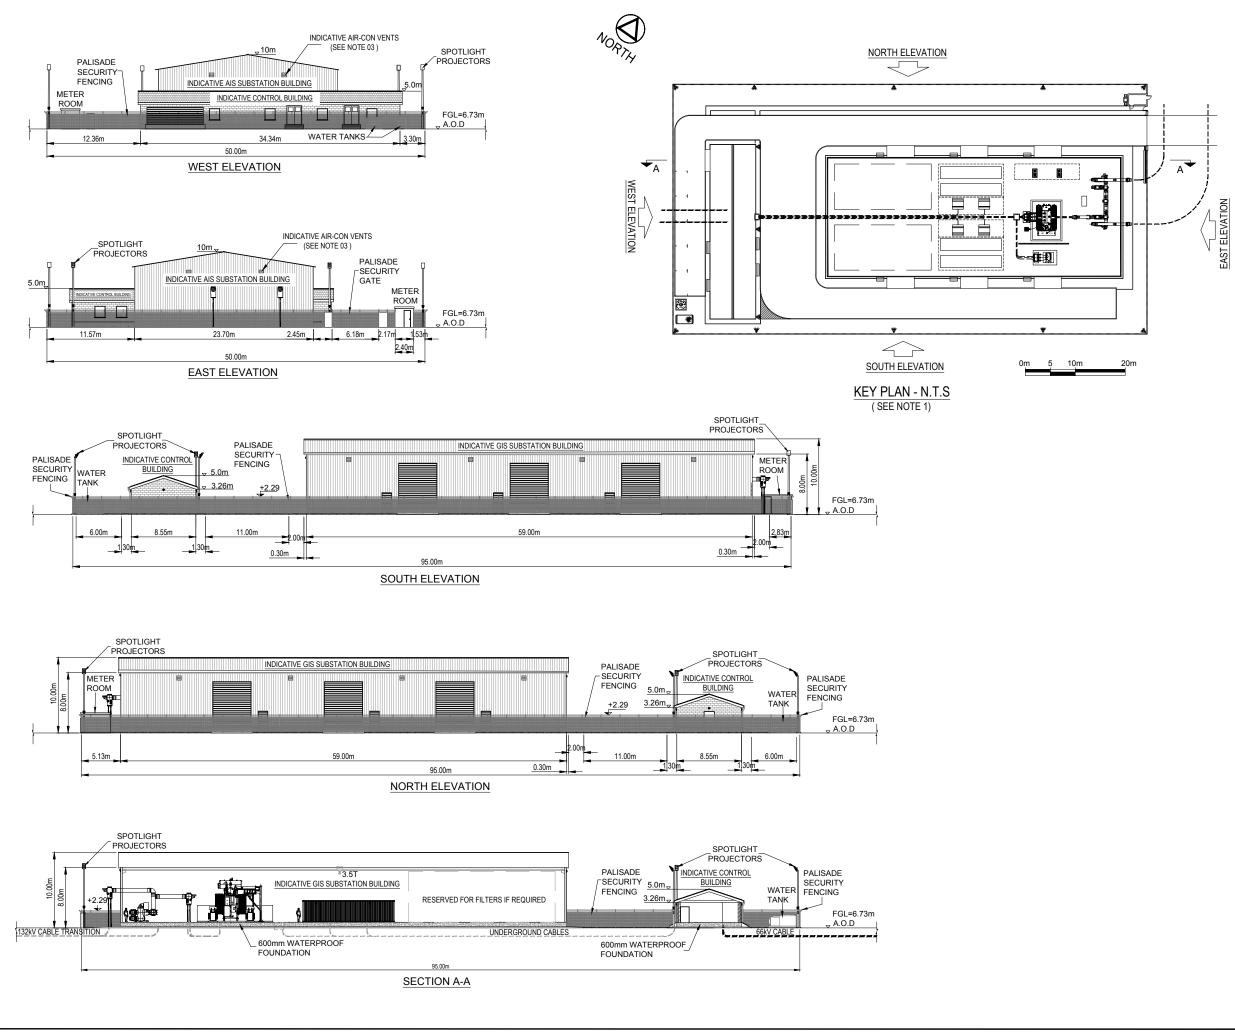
E 8: Elevation & Cross Section Drawing: Indicative AIS Enclosed Substation With Additional Equipment Space (Option C) (FLO-WHI-LAY-0010)
